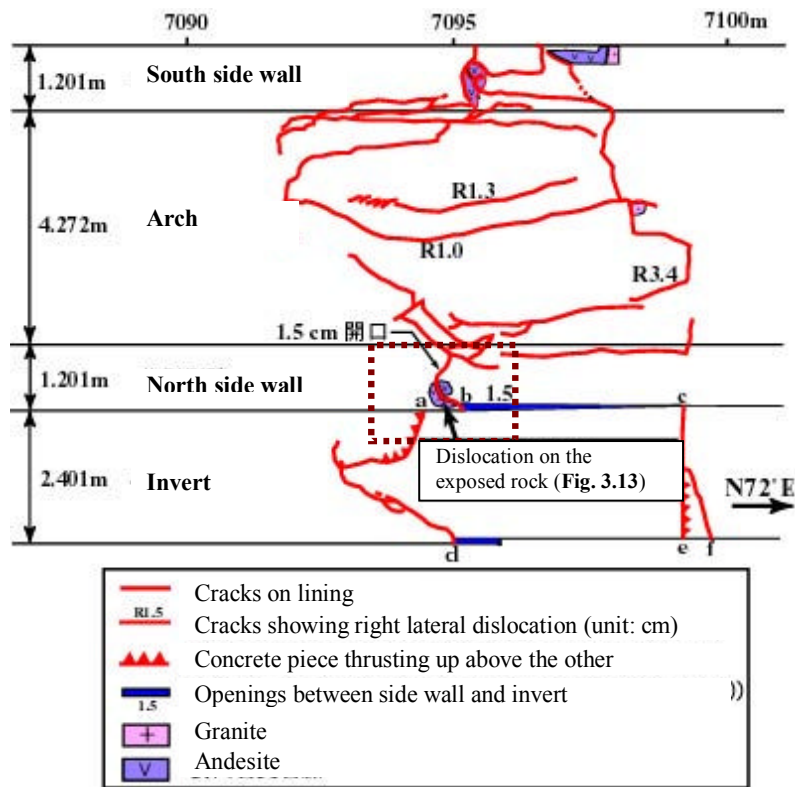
Cracks that appeared on concrete lining, Intake Tunnel of Omiya dam in the 2000 West Tottori earthquake (Ueta 2002).
